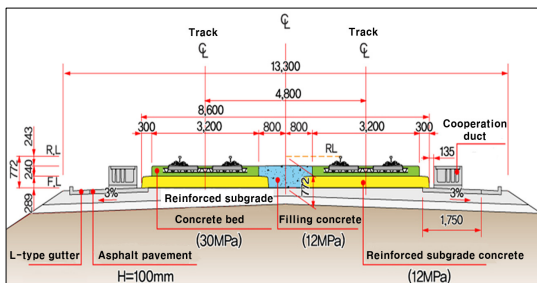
Cross sectional view of concrete slab track (Honam - high Speed railway)
